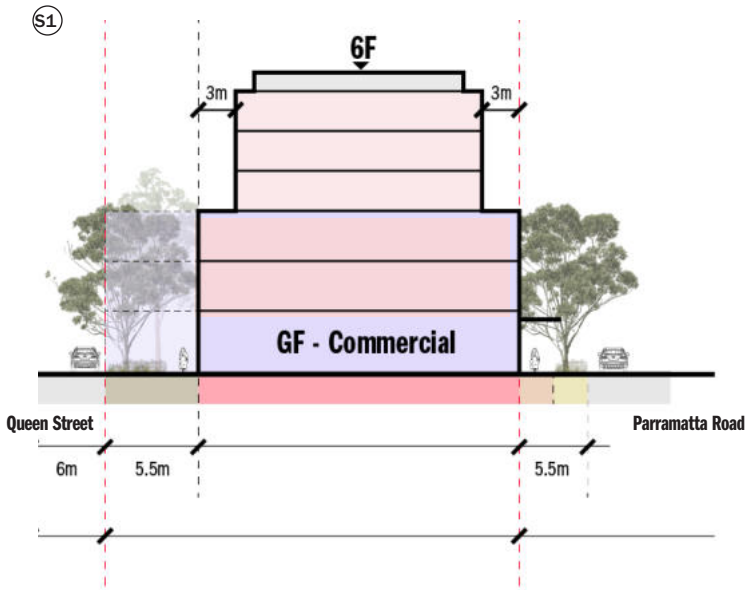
Section 1 - Parramatta Road side cross section showing setback conditions within HCA above existing three storey commercial building
